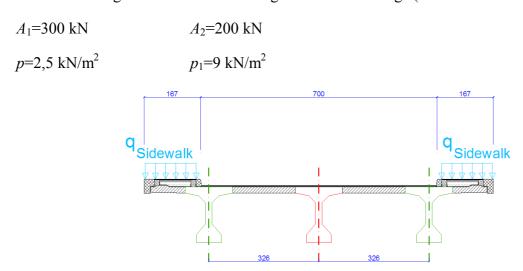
Pedestrian loading on the actual bridge (annotations in cm)
